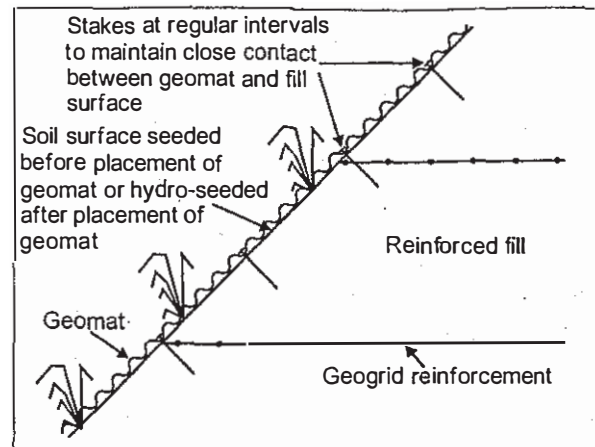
Vegetated facing detail for a shallow reinforced slope.
